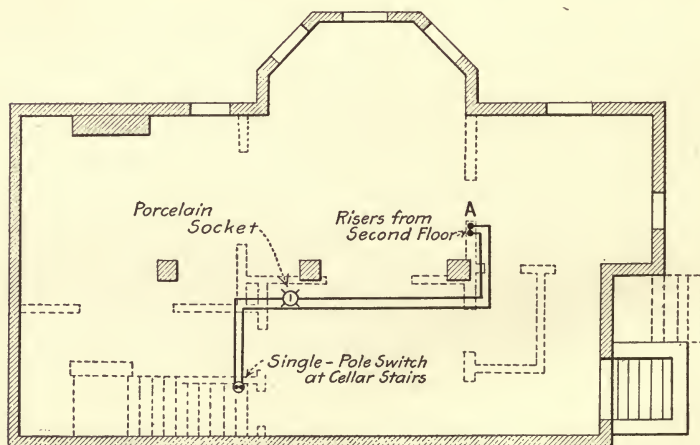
Floor plan of basement and also wiring in basement ceiling. (Dotted lines show locations of partitions on first floor.)
